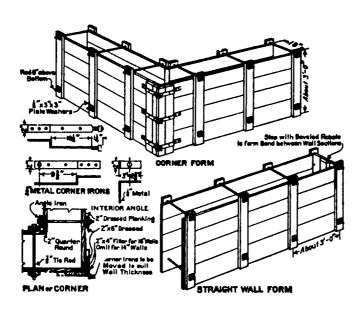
Figure VII. Corner and Straight Wall Forms for Rainmed Earth.
